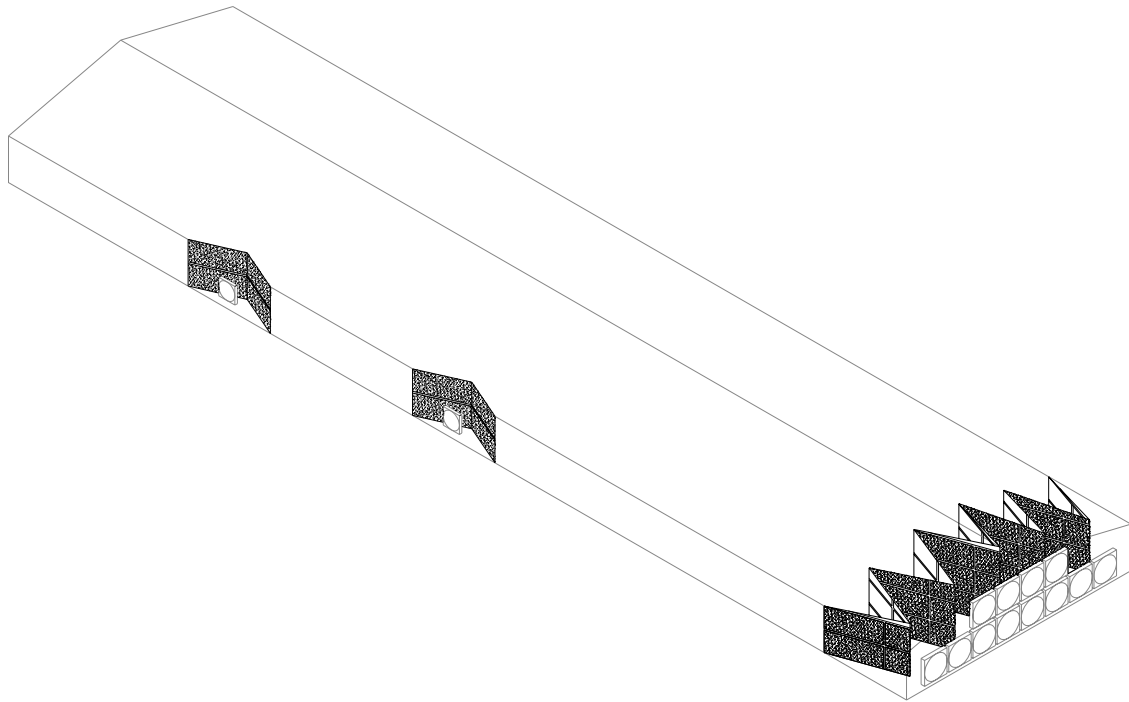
Using StuffNix on side mounted and all tunnel ventilation fans
